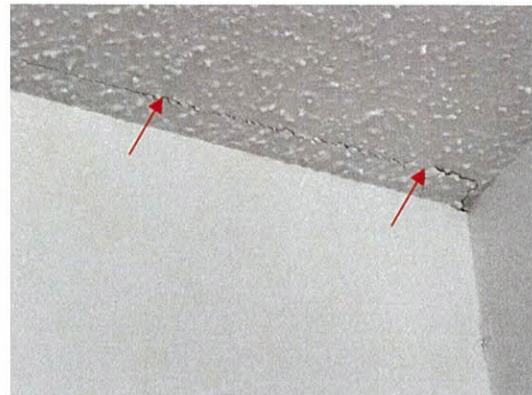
Crack at window header caused by the buffeting of windows from Irma's wind pressures.
